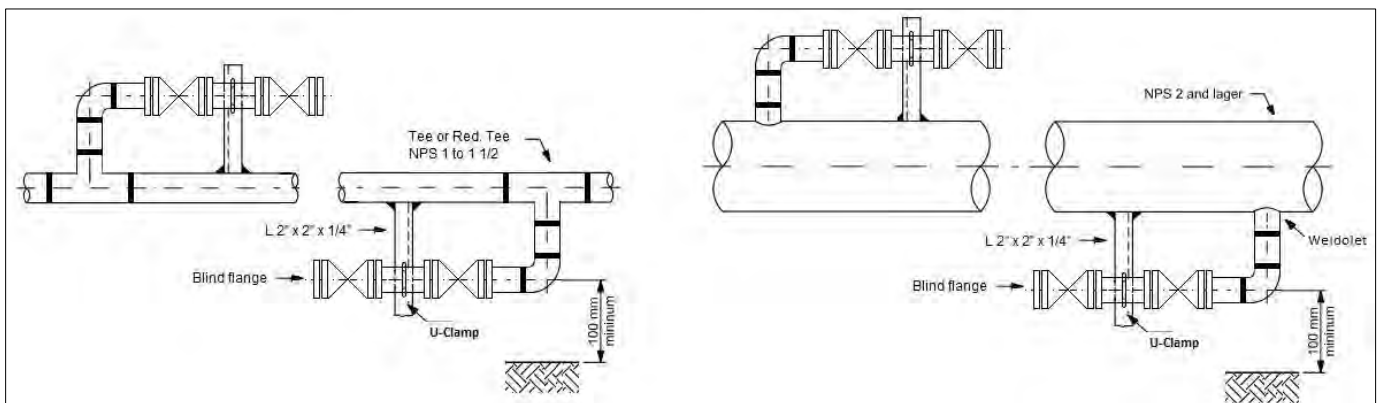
B - Drain & Vent two flanged valves with blind flange end
